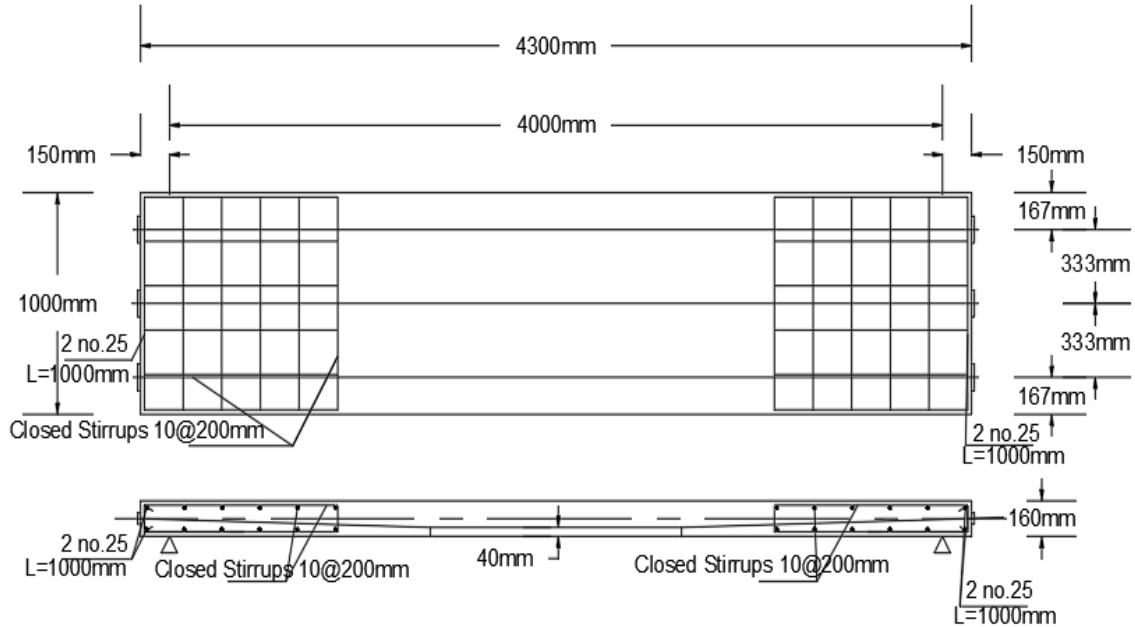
Post-tension bonded or unbonded slab cross-section and plan with all reinforcement and tendon details
